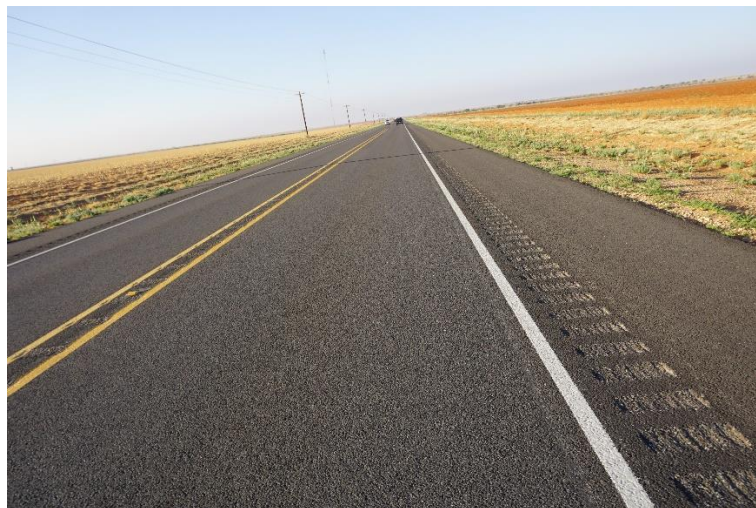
No Cracking on the Test Section with PG70-28 on SH 214.
